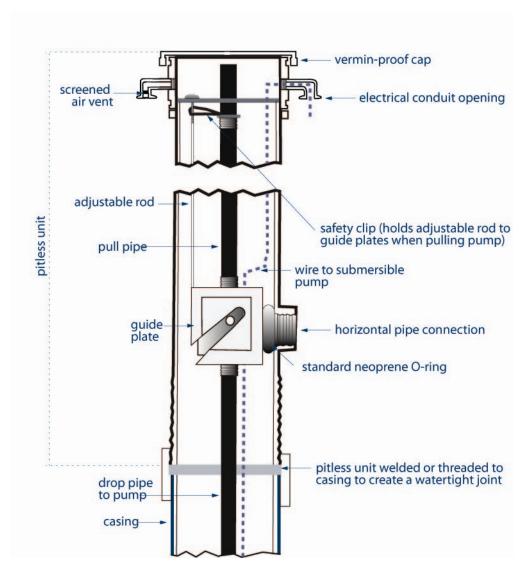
CROSS-SECTION OF PITLESS UNIT
